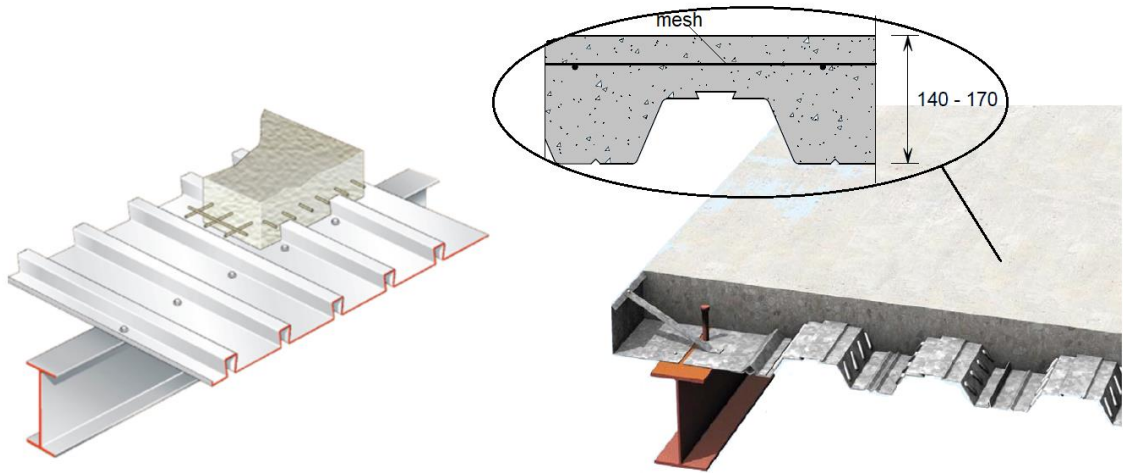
General views of the non-composite (on the left) (Lindab n.d.) and shallow composite (on the right) floor with cast-in-place concrete slabs and steel decking (Arcelor Mittal & Peiner Träger 2008b)
